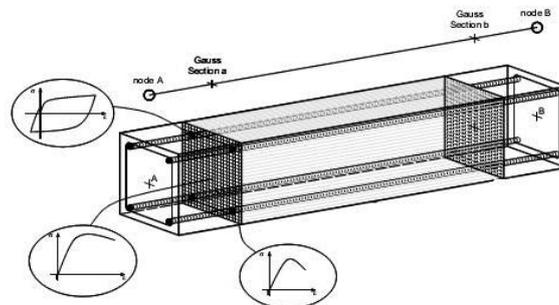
Distributed hinge modeling of a reinforced concrete beam (adopted from SeismoStruct V6)
